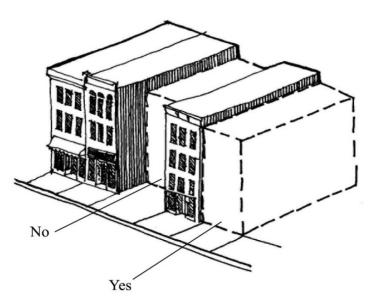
All building should be built to the front lot line. Corner buildings should be built to the corner lot line.
